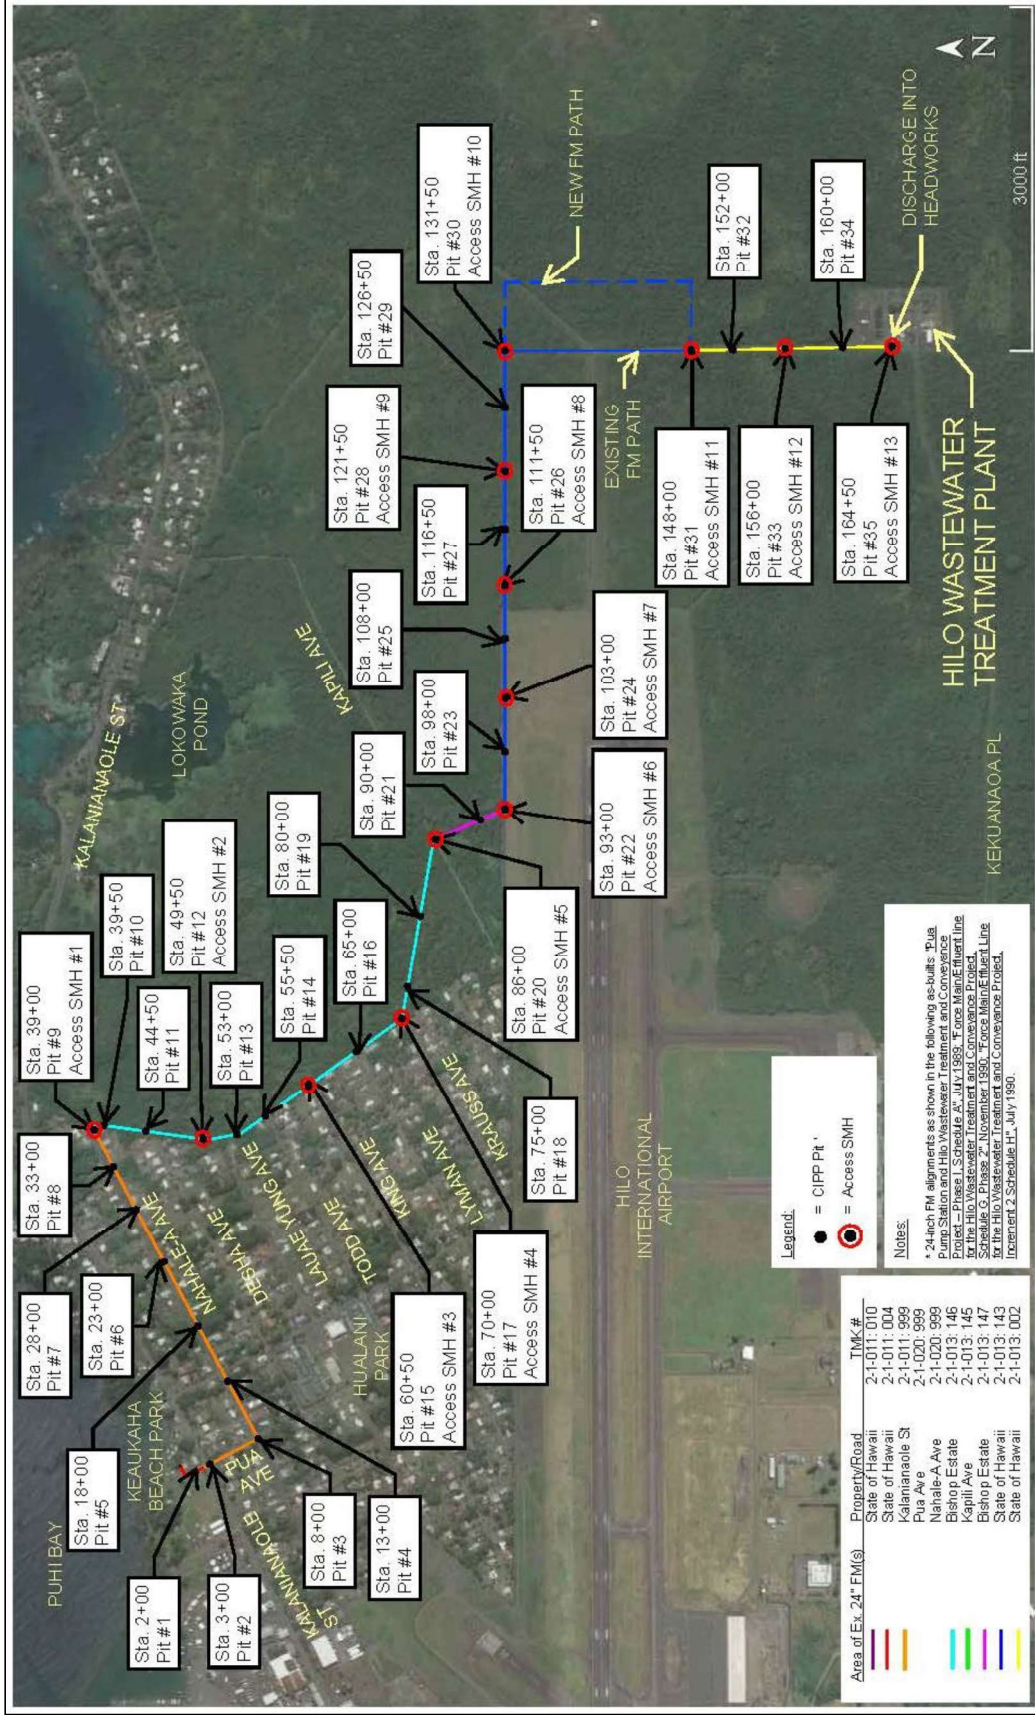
Detail of Proposed CIPP Pit and Access Sewer Manhole Locations (courtesy of client)
